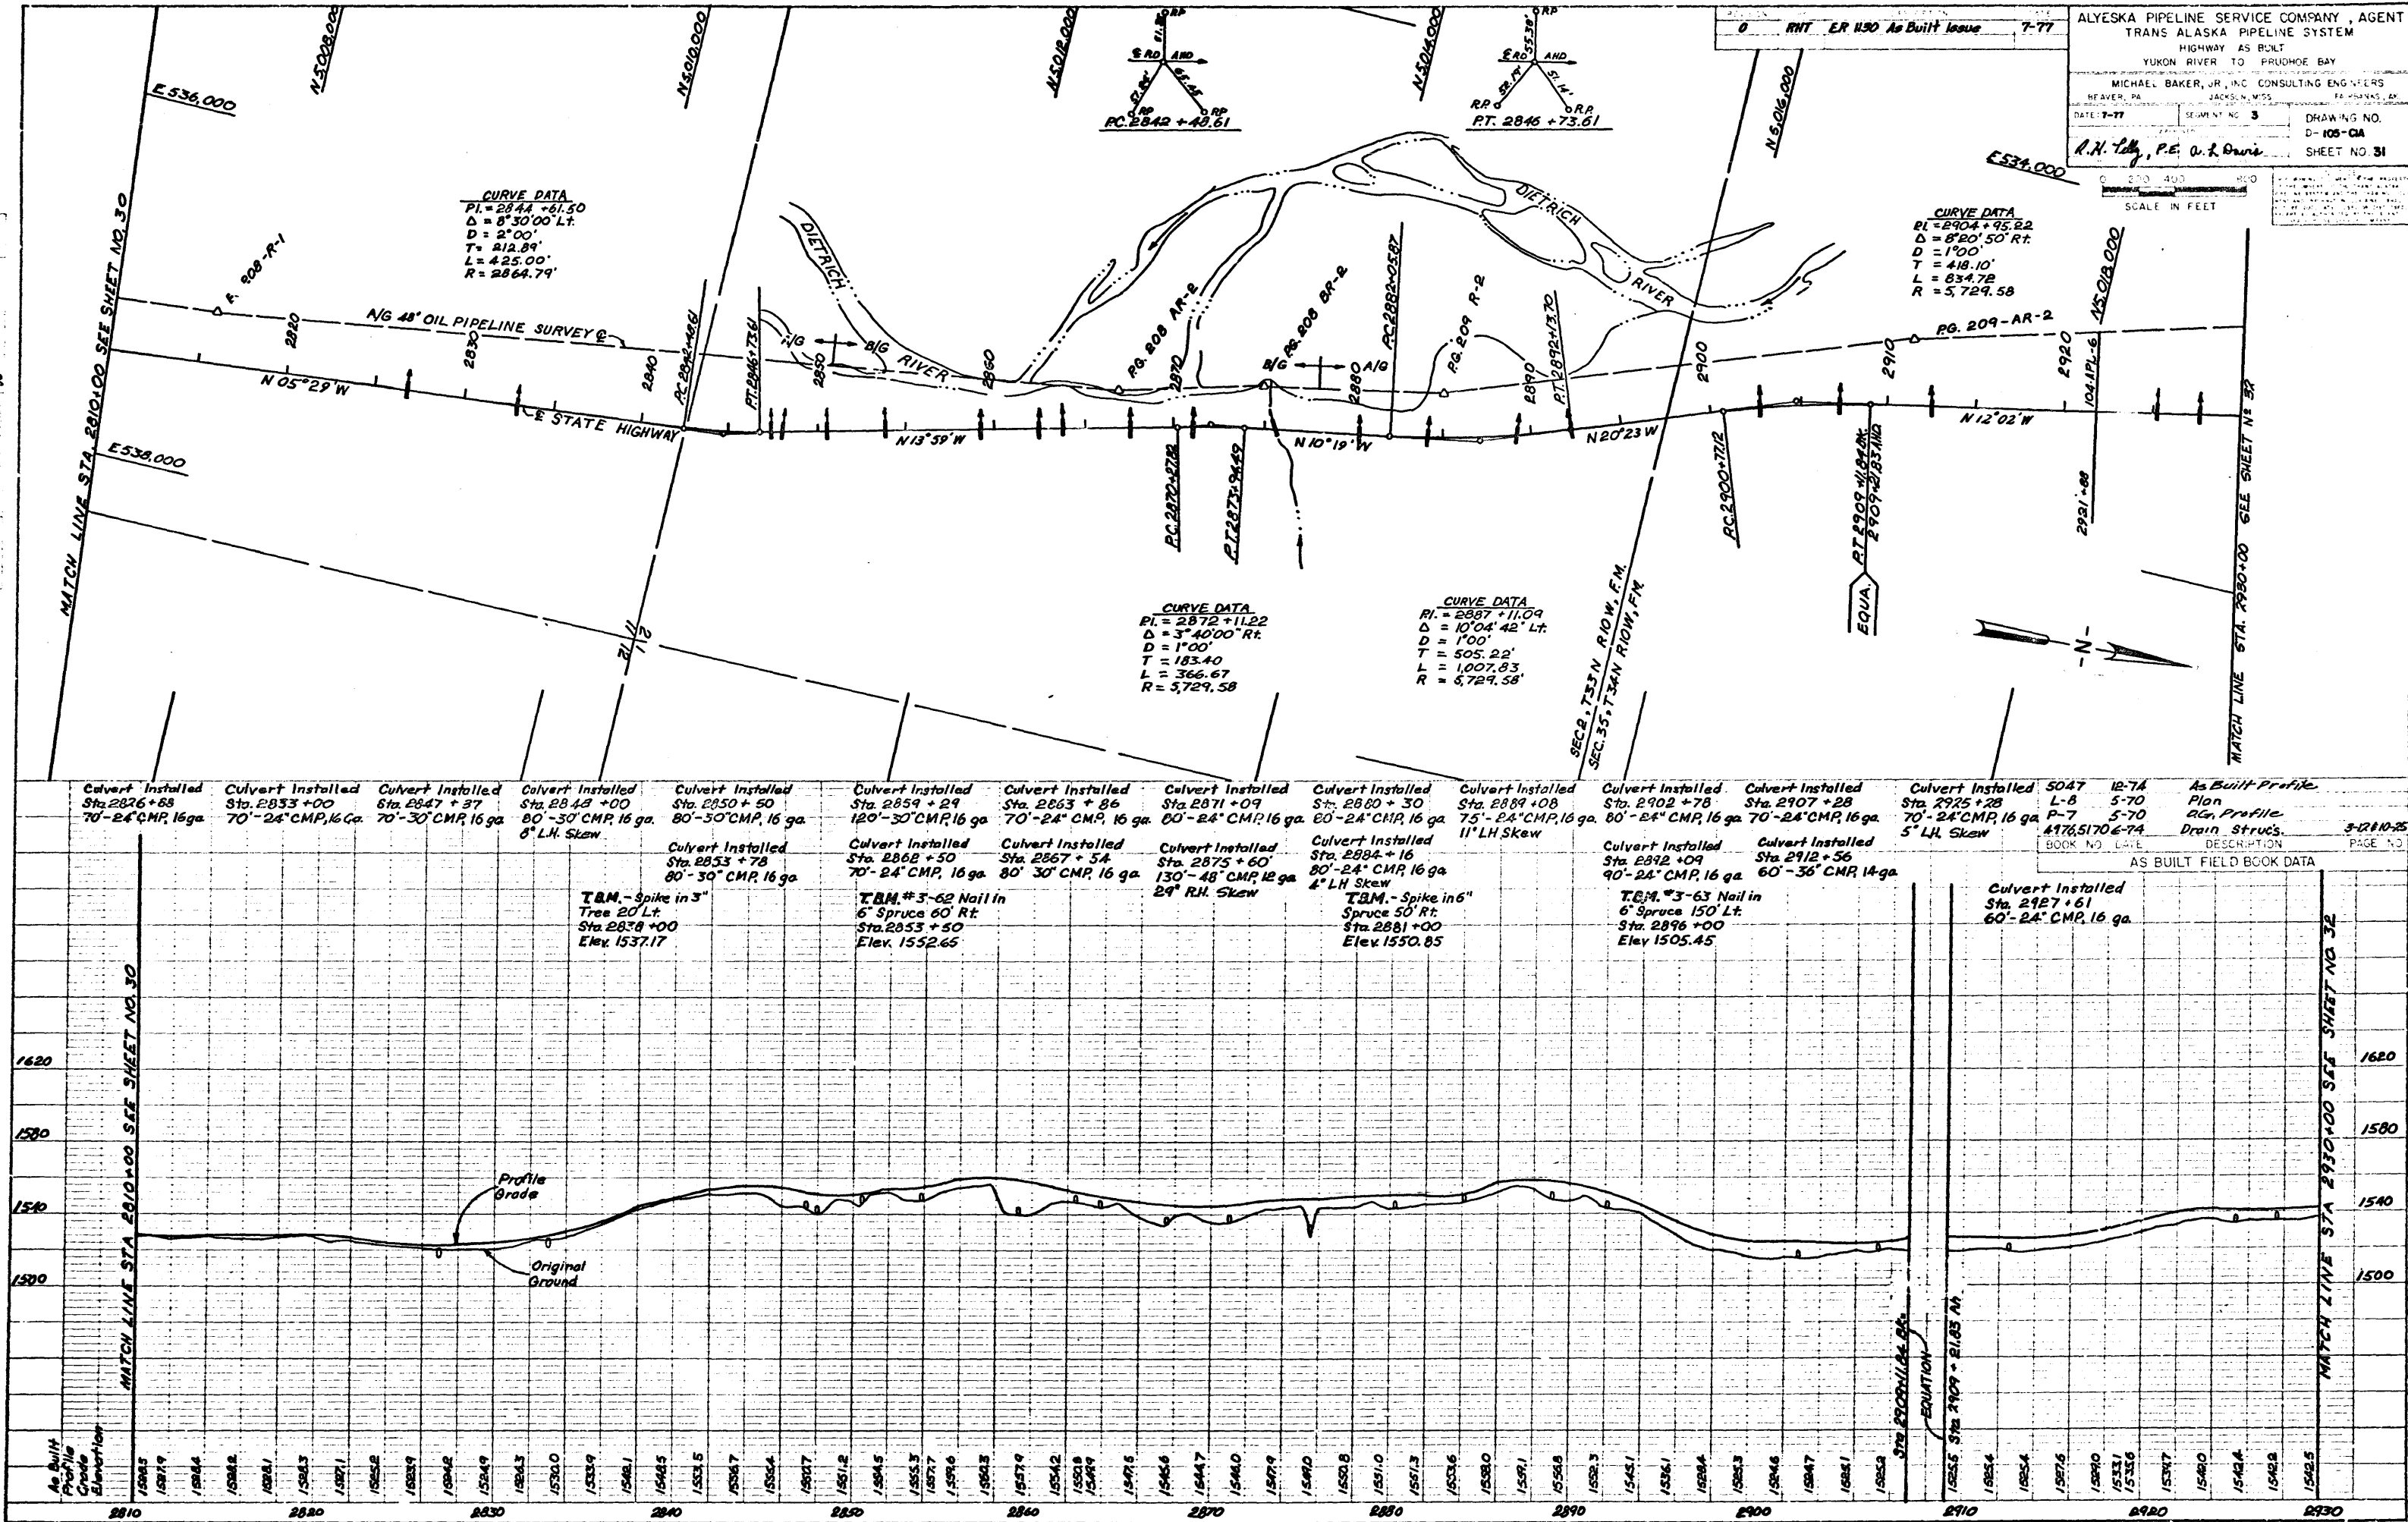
PLAN - PROFILE B.P.R. STANDARD
